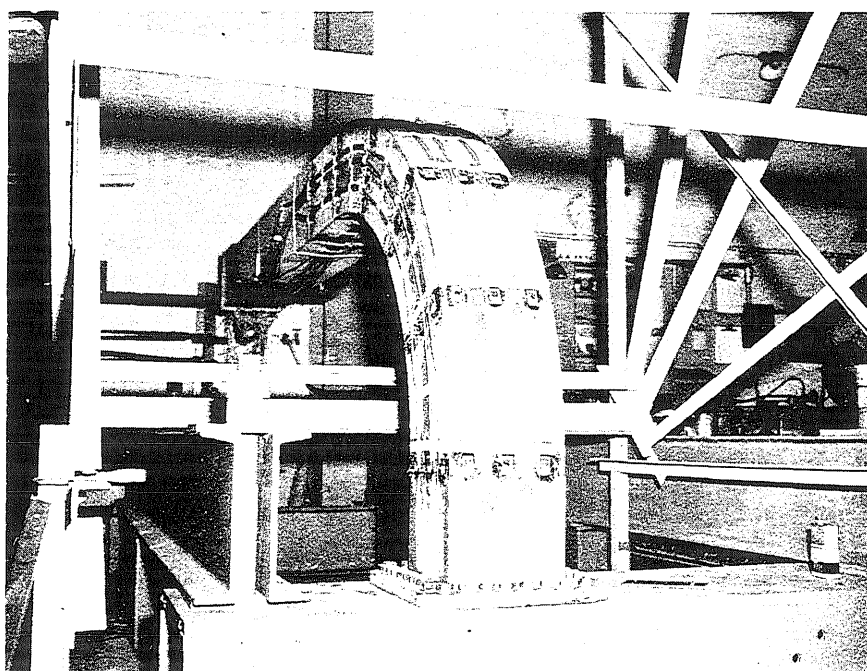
CONNECTION BETWEEN THE TEST SPECIMEN AND SUPPORTING FRAME
